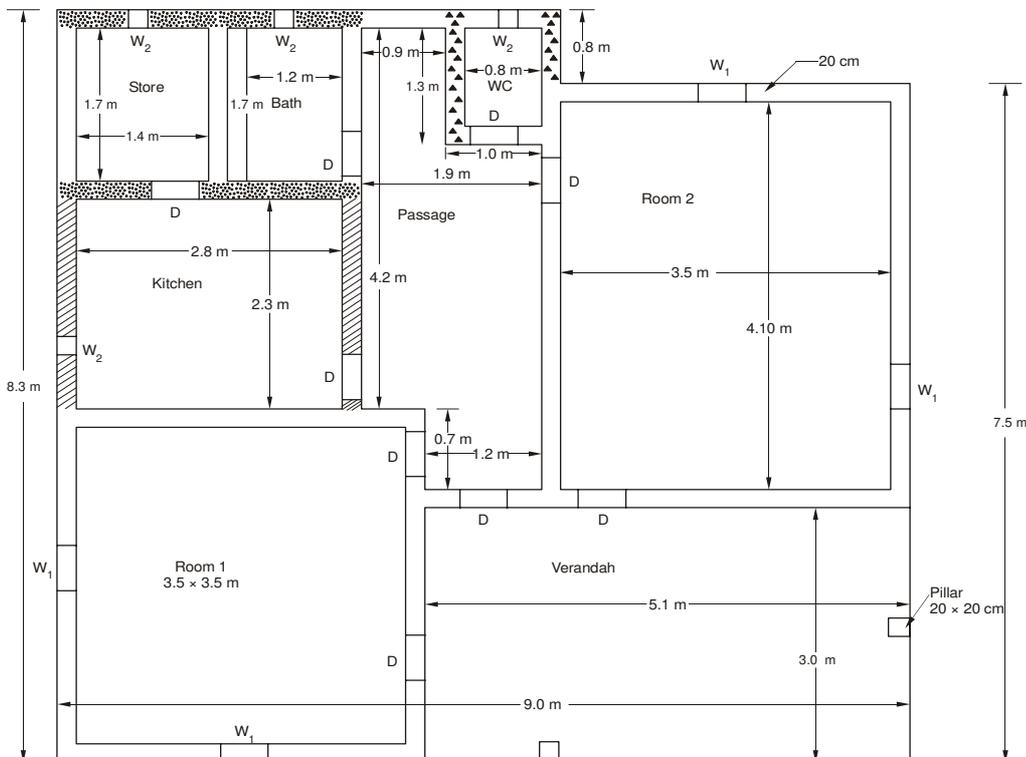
Plan of a Building (Figure 3.7) above Plinth Level –
